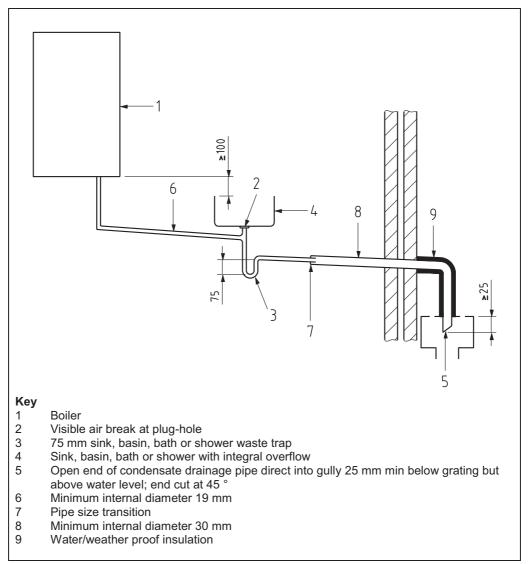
(b) – Connection of a condensate drainage pipe upstream of a sink, basin, bath or shower waste trap
